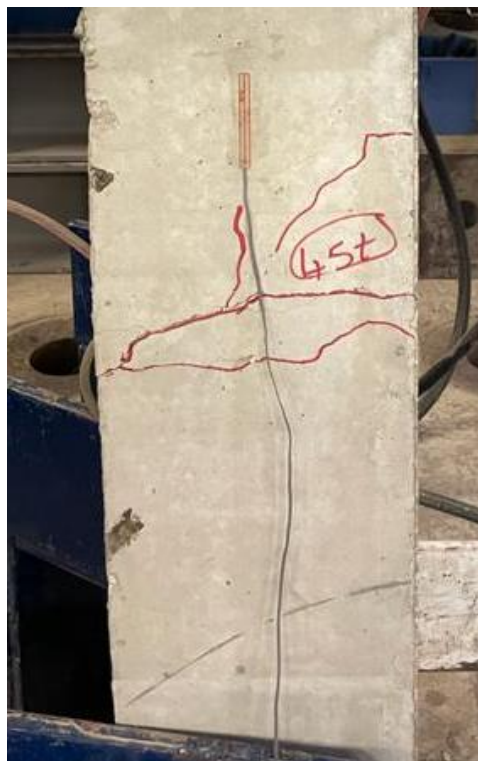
Cracks at the Tension Side of Column 1.5C00
